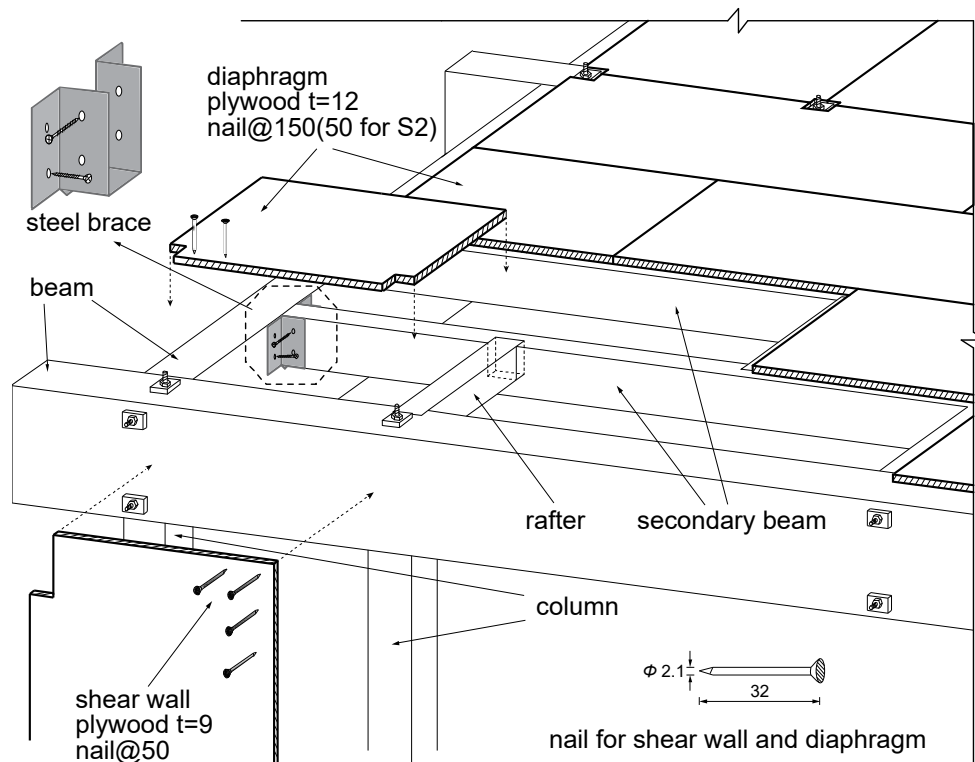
Layout of shear wall and diaphragm at the roof (in mm)
